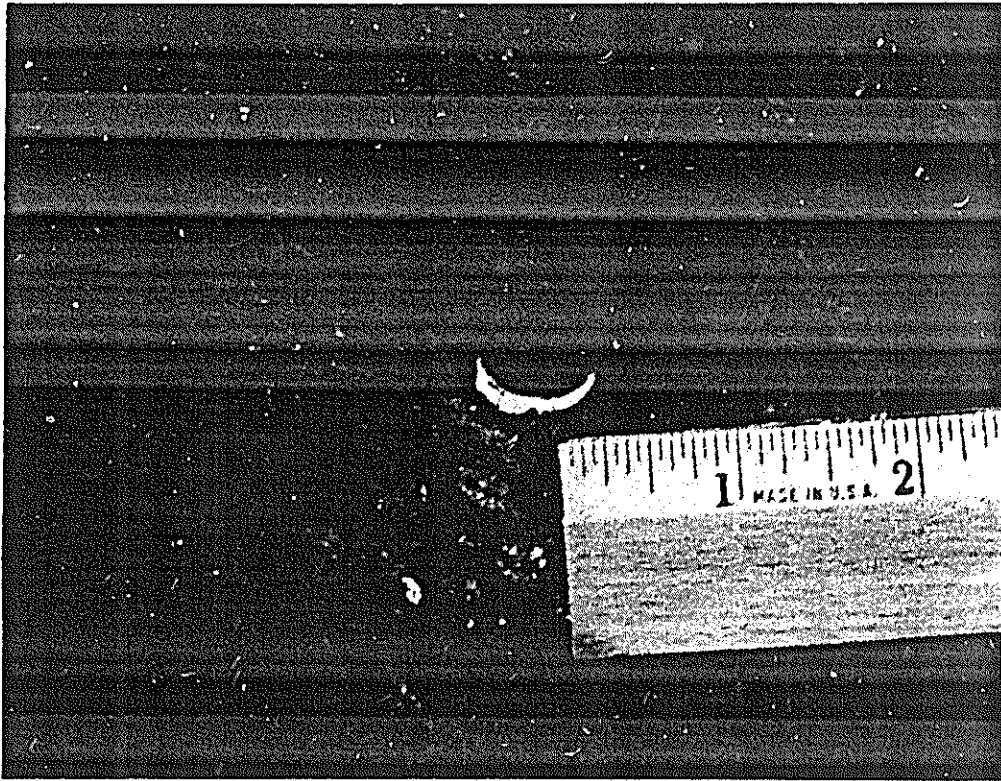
Root holes containing hardened grout. (The voids in the grouted sand were not sealed.)
